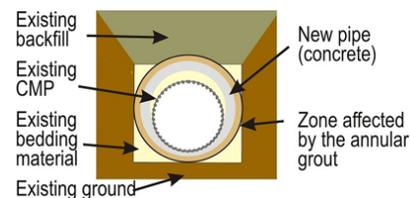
Placement of a new RCP through the existing CMP culvert (Tenbusch et al., 2009)
